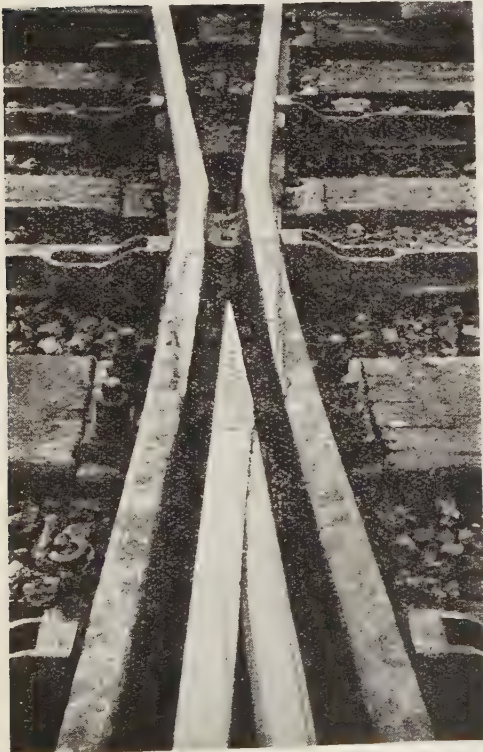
Acute crossing built up by electric arc welding (*French Nord Railway*).
